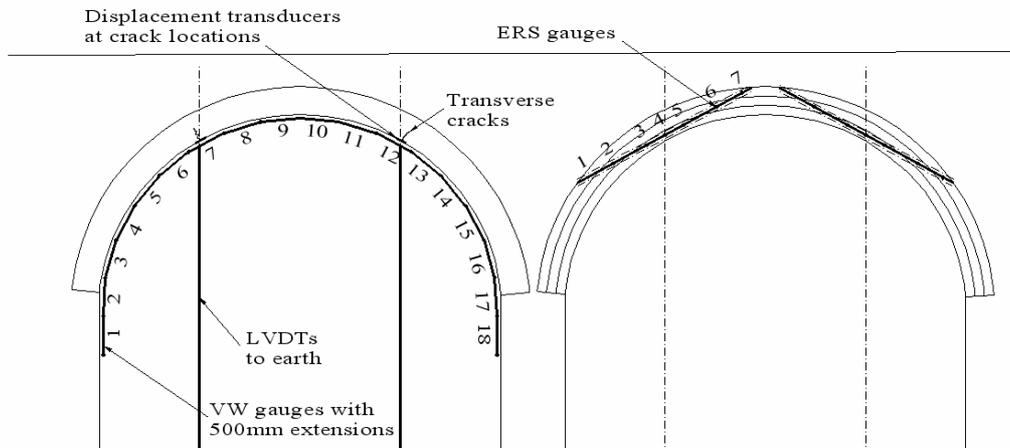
Bridge Instrumentation (masonry – left span, and anchors – right span)
